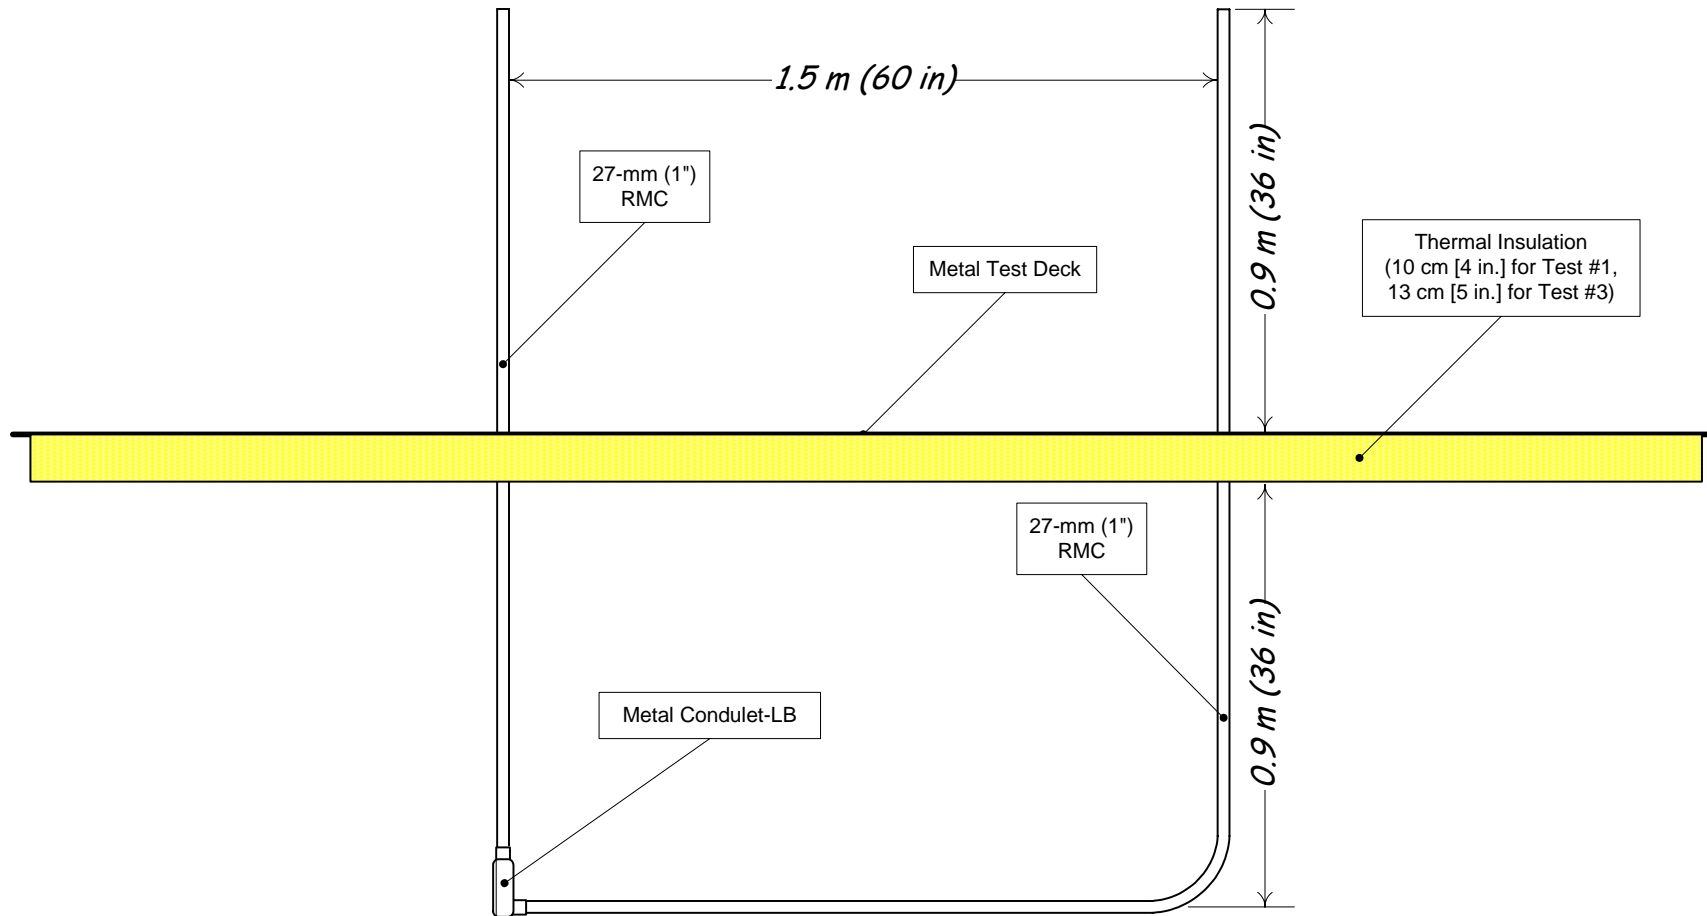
27-mm (1-in) rigid metal conduit test specimens (side view with dimensions).
